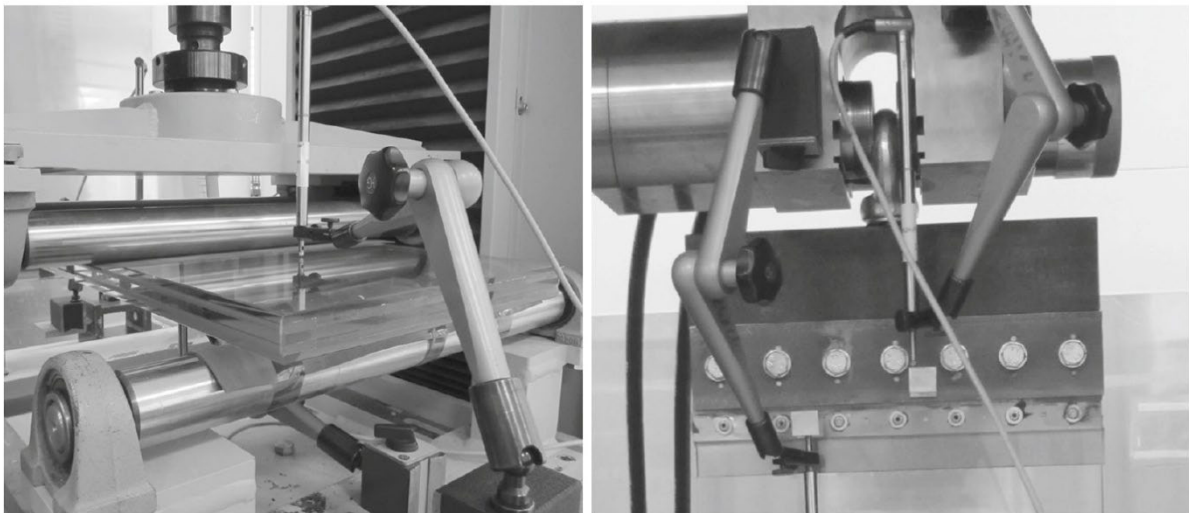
Fourpointbending test (left) and tension test (right). Source: Marinitsch, S., Schranz, C., & Teich, M. (2016). Folded plate structures made of glass laminates.
